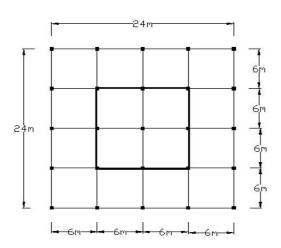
Plan of flat slab building and regular frame building with shear wall at core
